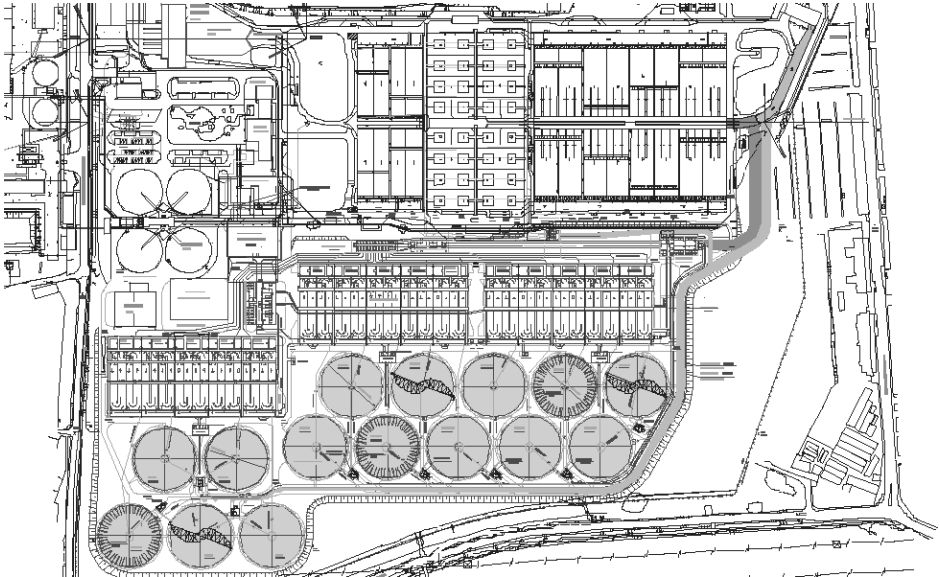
MTPV: existing plant (upper part) and plant extension (lower part, under construction)
